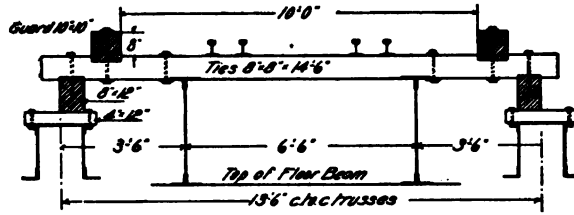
MANCHESTER BRIDGE - M. & N.W. R.R.
